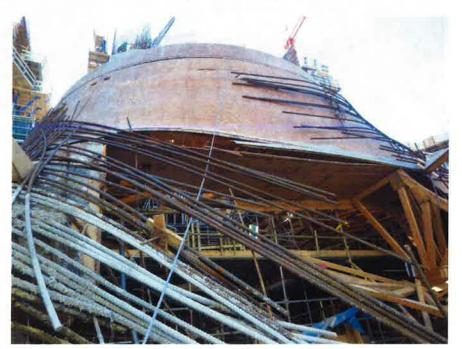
View from downstream of the hole left by the collapse of shoring towers supporting A29
